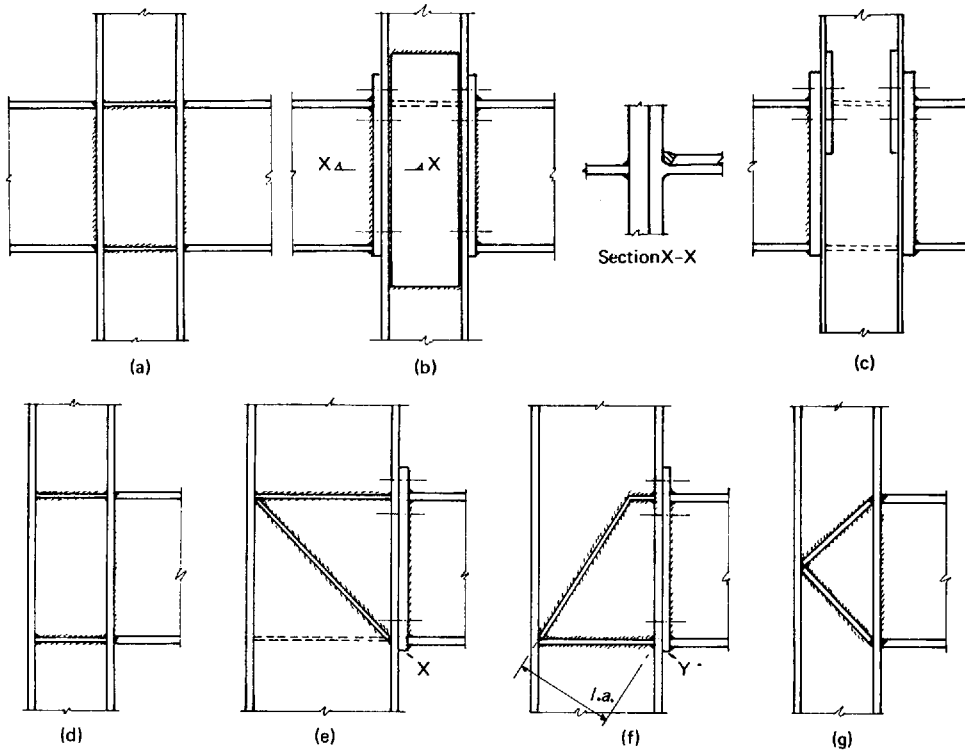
Stiffeners for rigid beam-to-column connections. (a) Traditional stiffening for interior column; (b) web plate; (c) backing plates for tension bolts; (d) exterior column; (e) compressive diagonal stiffener; (f) Morris stiffener; (g) 'K' stiffeners
